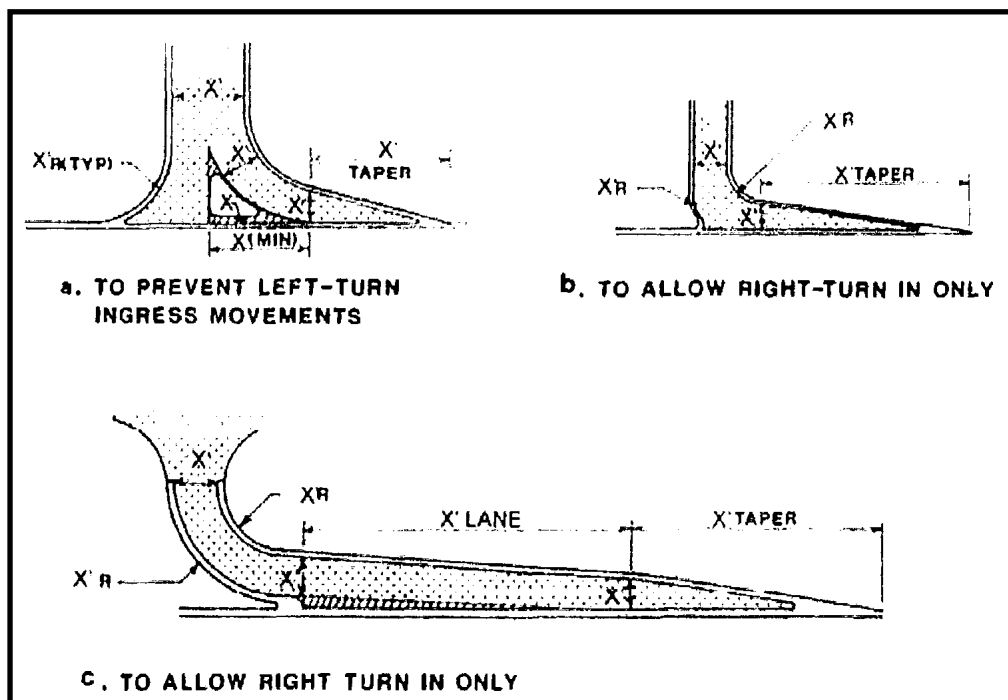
Boulevard Driveways (Figure A2-3)
